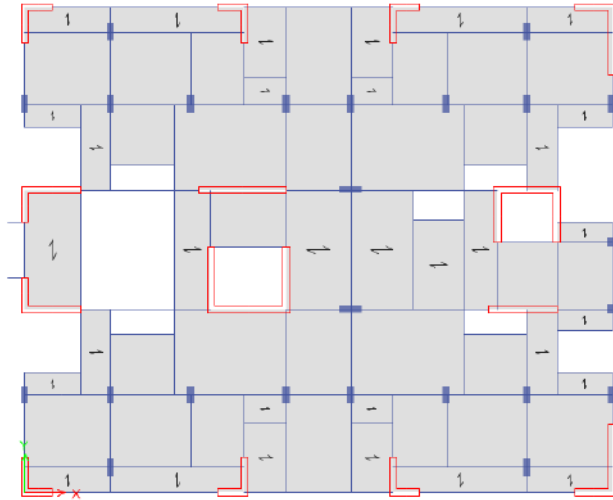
Parking Floor level (Ground floor slab) of Model-1
